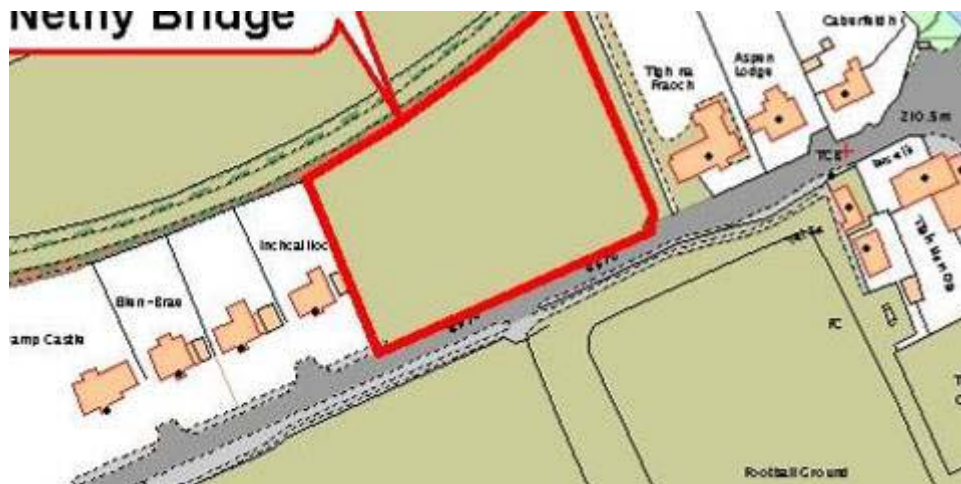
Proposed site in the context of the building line of adjacent properties
